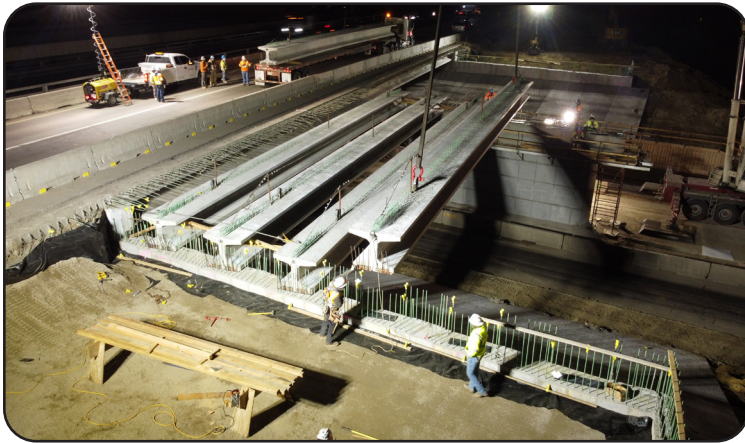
Girder Placement for the New I-76 over York Street Bridge Image 19. Completed I-76 over York Street Bridge
